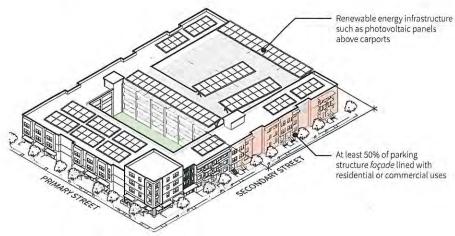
Parking garage wrapped in a separate building use such as residential or commercial.
